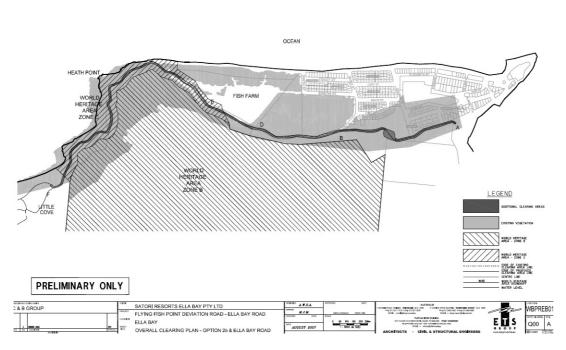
On-site clearing plan (located in Volume 3, Section 3.1).
